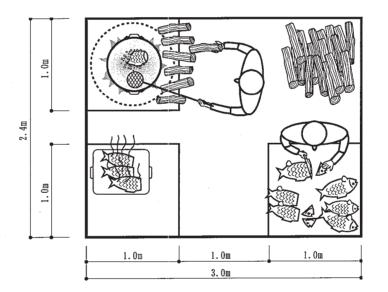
Utilization Plan of Fried Fish Processing Lot
